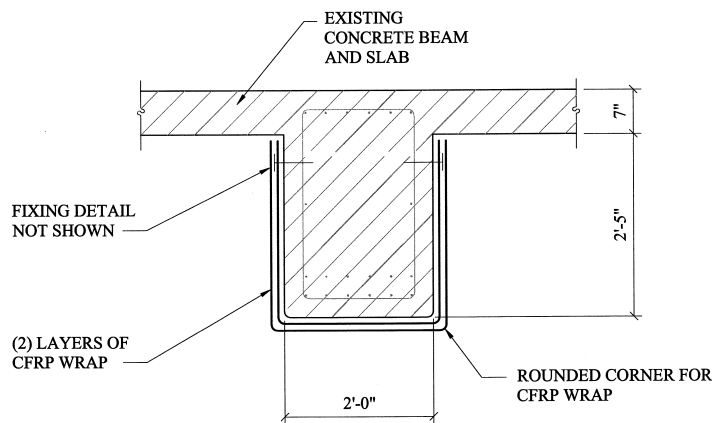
Strengthening of Post-tensioned Concrete Beam by CFRP Wrap
